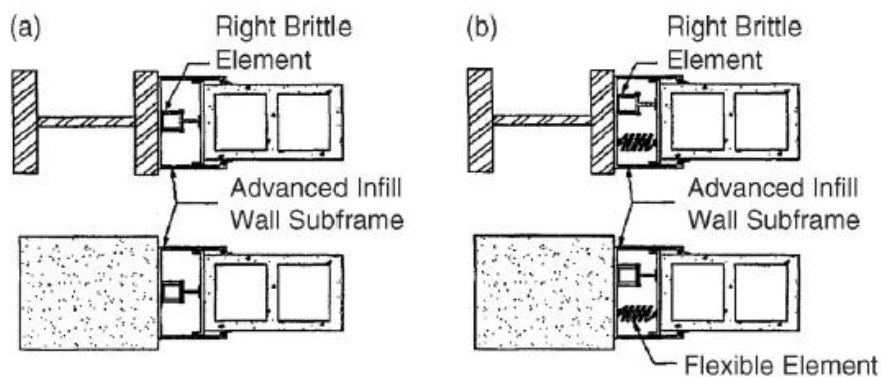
Details of SIWIS subframe system between infill wall and column from [6].
